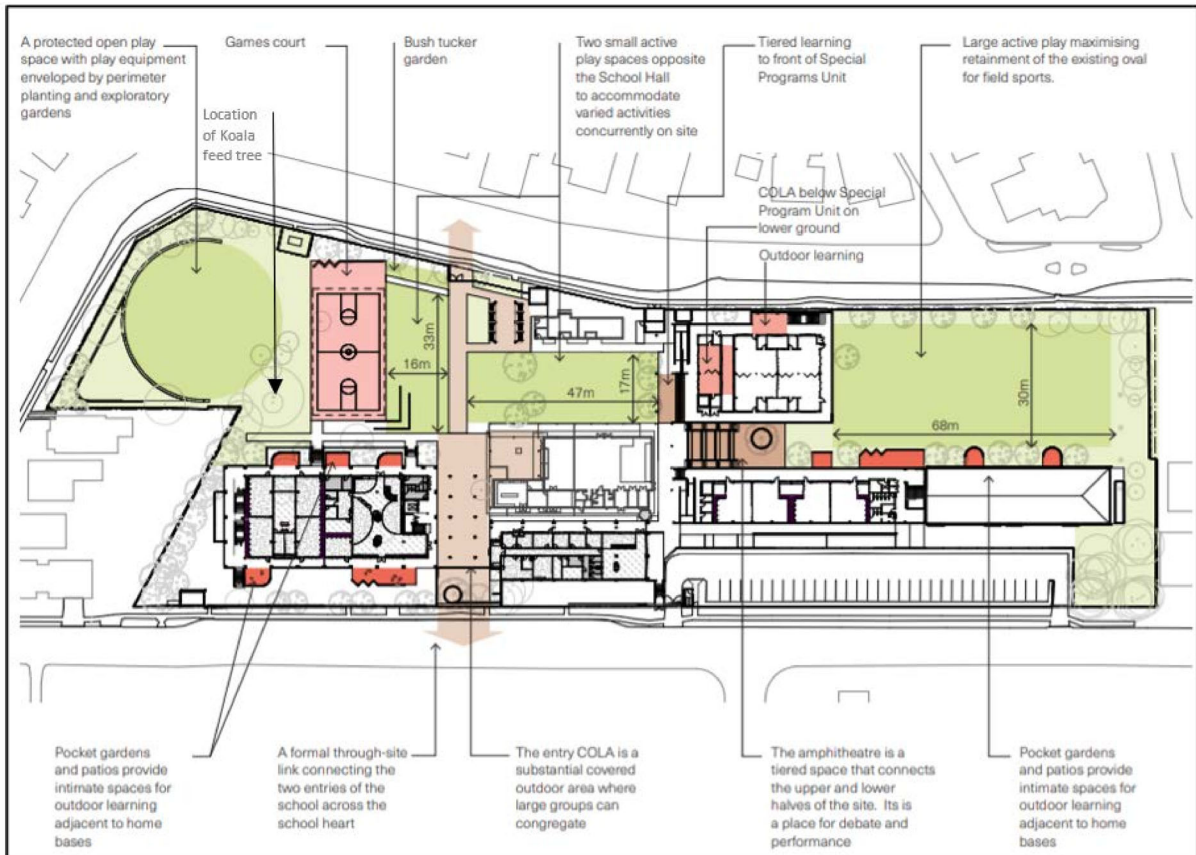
| Proposed landscape plan (Source: EIS 2021)
